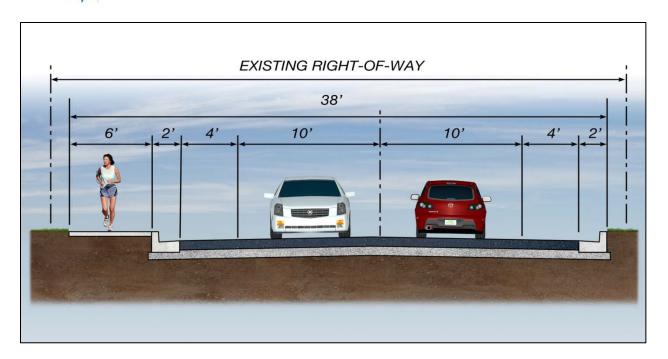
Proposed Roadway Section West of Proposed Movable Bridge
